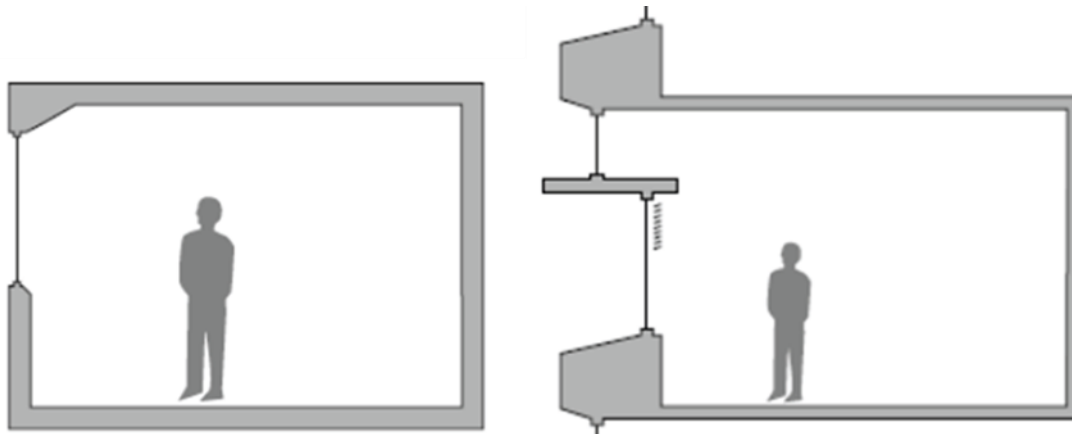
Section of Facade (a) Sloped surfaces at opening to soften glare; (b) Deep wall section for self-shading
